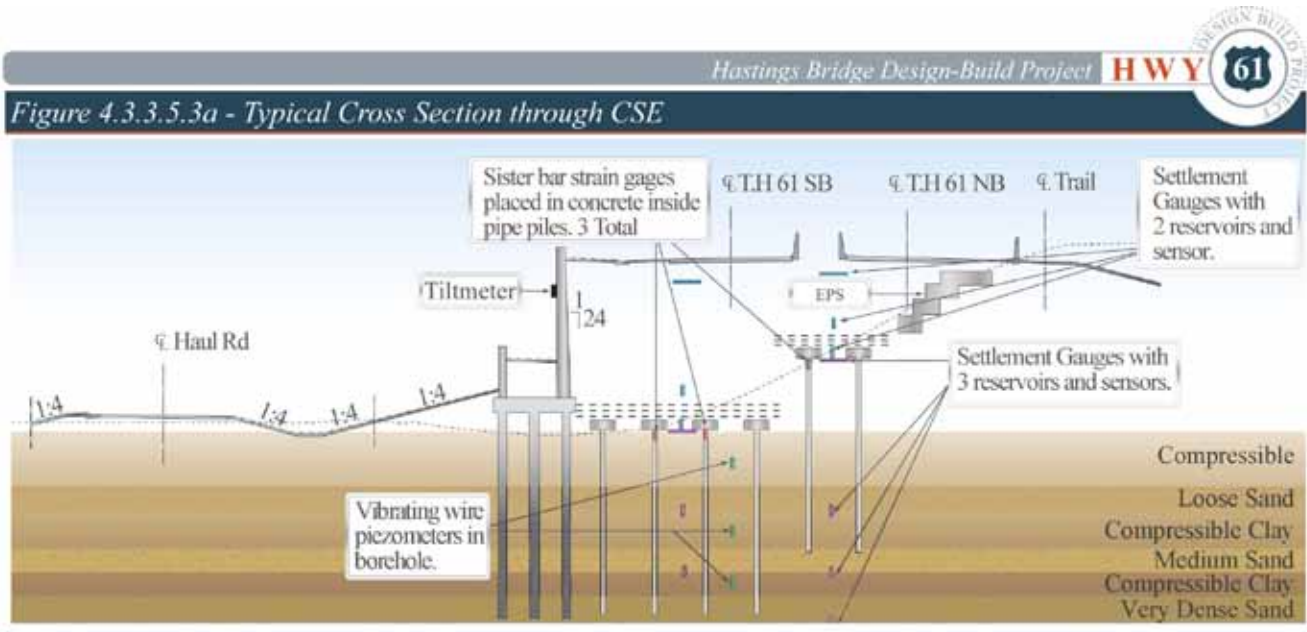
Cross section of the Hastings Bridge column-supported embankment (Behnke and Ames 2010).
